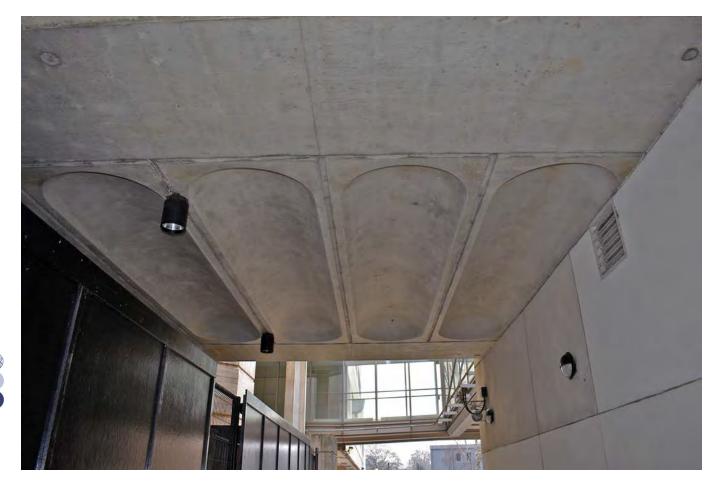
Underpass on west side of Level A of the Tinbergen Building, looking south
